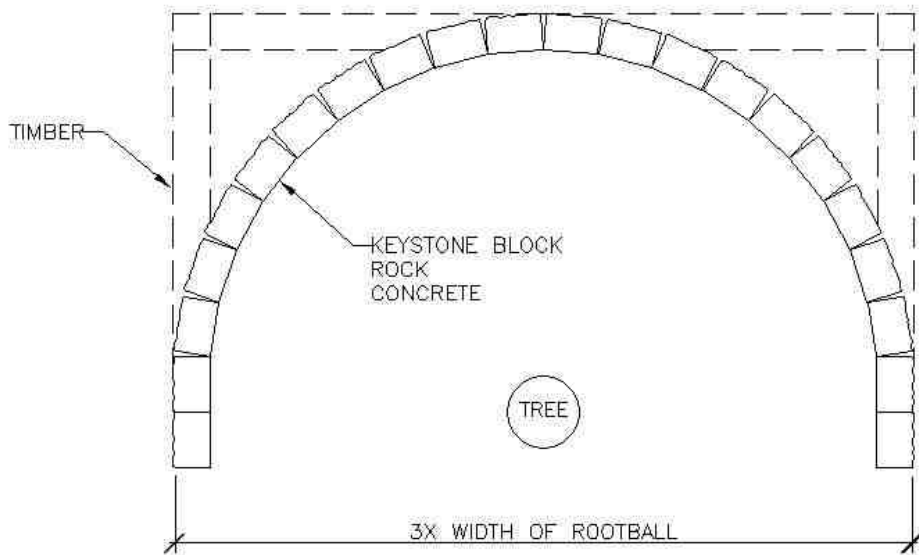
Planter for Slopes Greater than 3:1 / Section
